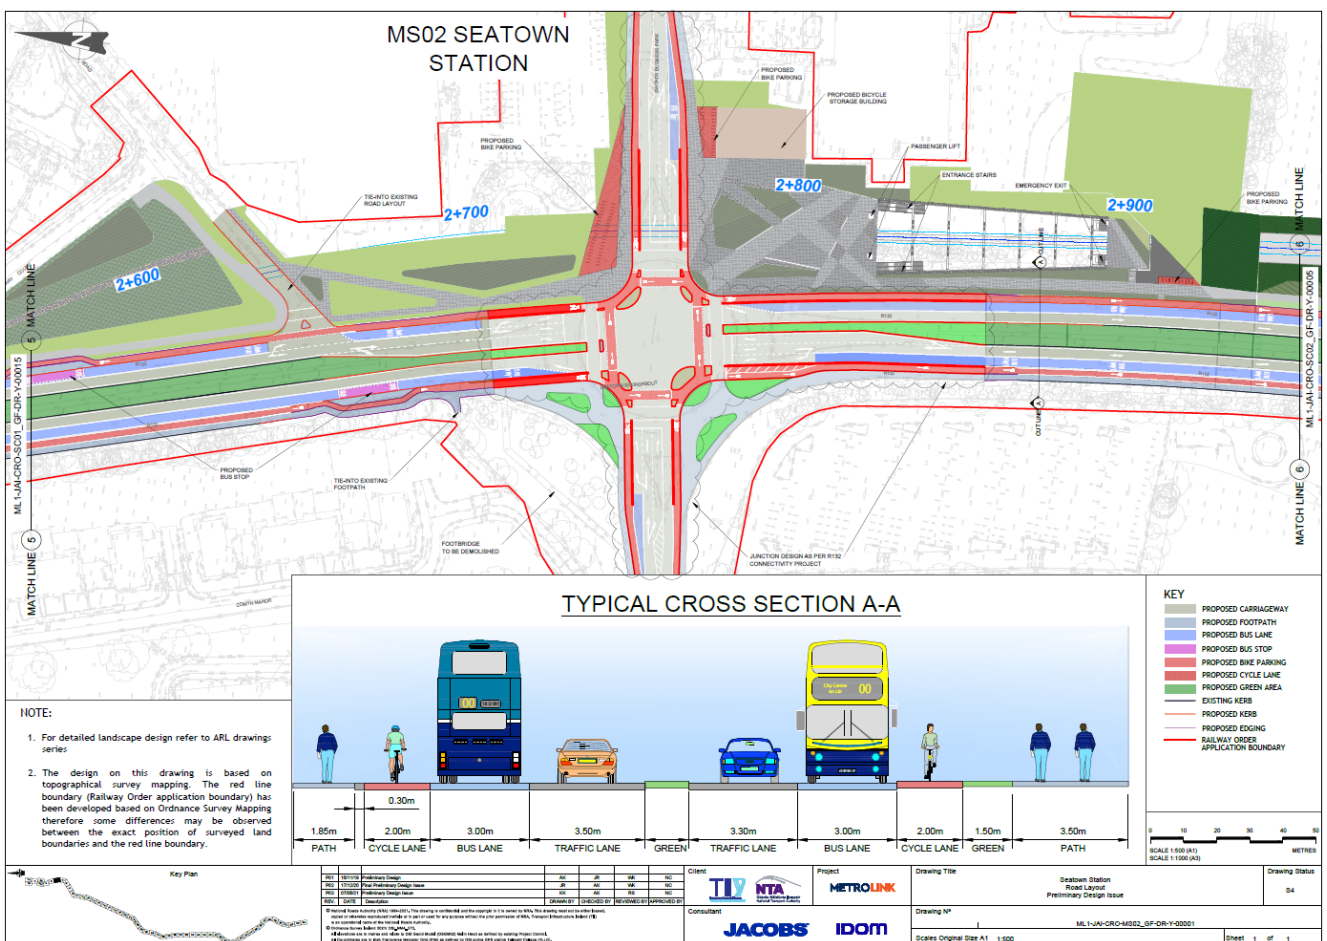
Seatown Station Plan with R132 Connectivity (ML1-JAI-CRO-MS02\_GF-DR-Y-00001)
